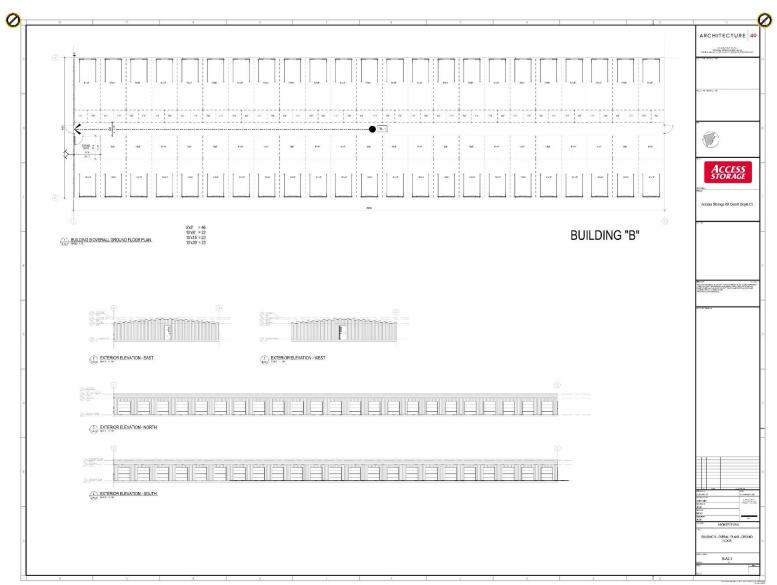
Proposed Building Elevations and Floor Plans - Building B (prepared by Architecture 49, dated December 7, 2022)
